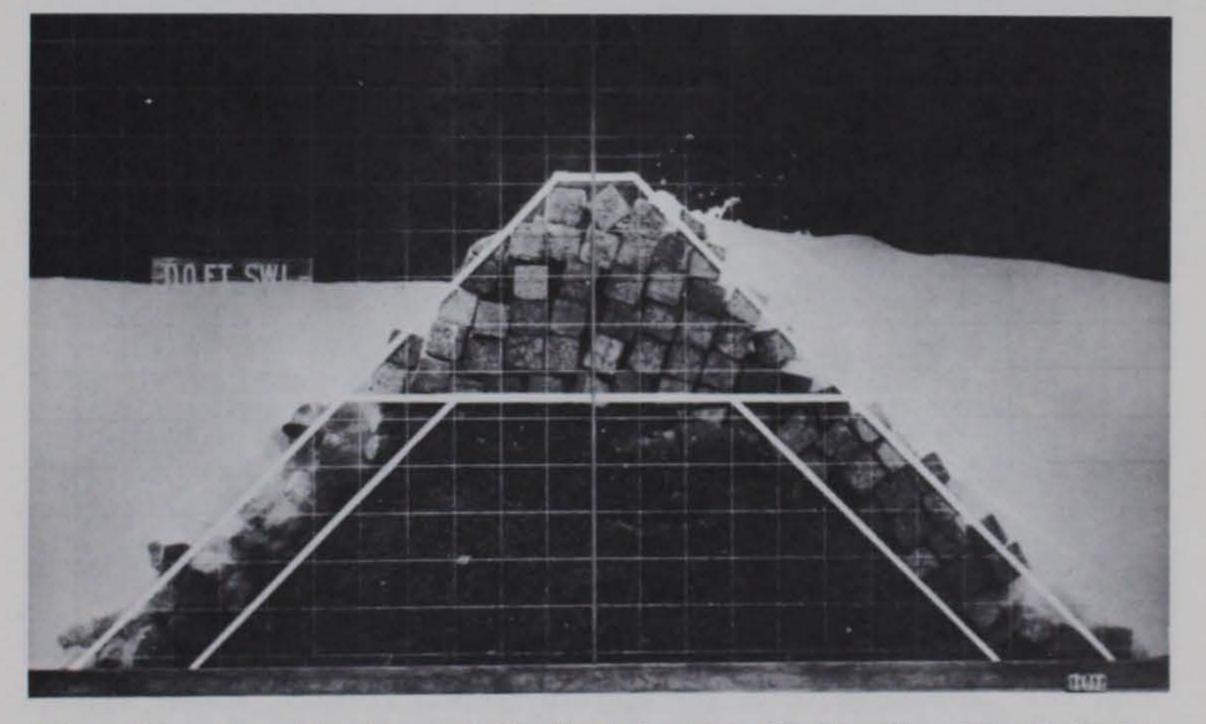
Investigation of the Epstein-Tyrrell formula, 10-sec waves, 19 ft high, attacking a rubble breakwater constructed of 36.4-ton, 2.8-specific-gravity, concrete-block cap rock placed on a 1-on-1 slope
